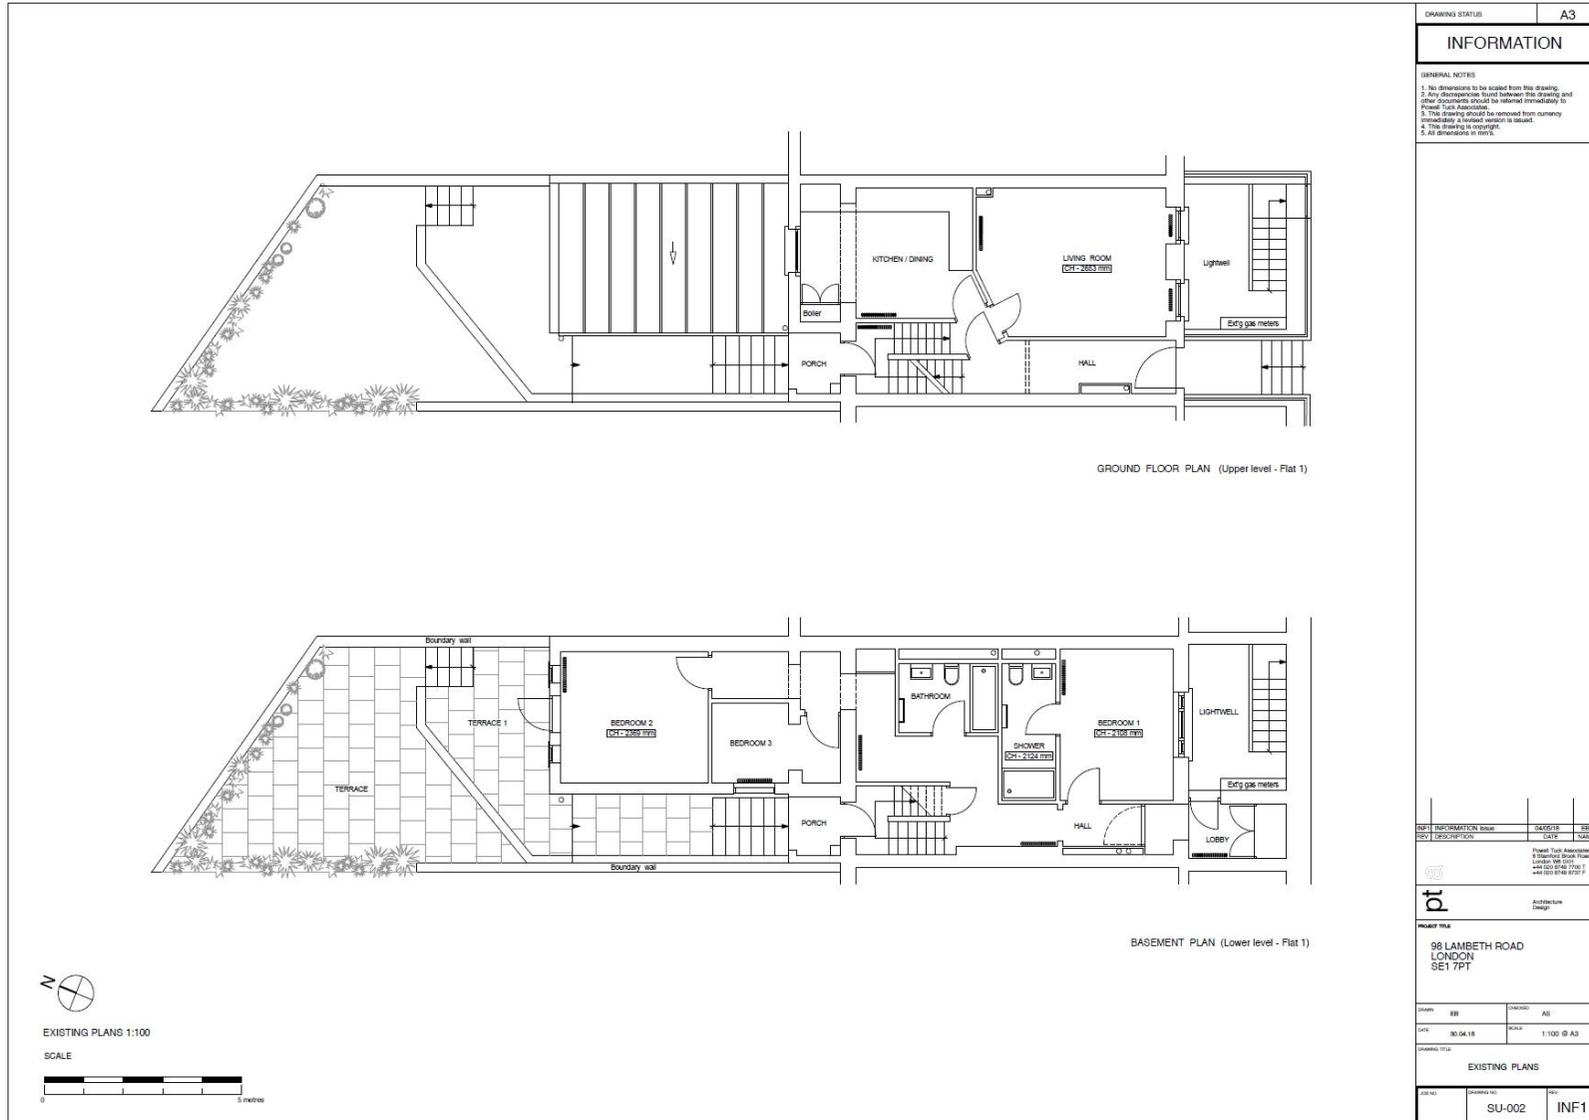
Basement and Ground floor plans of No. 98 Lambeth Road as existing
